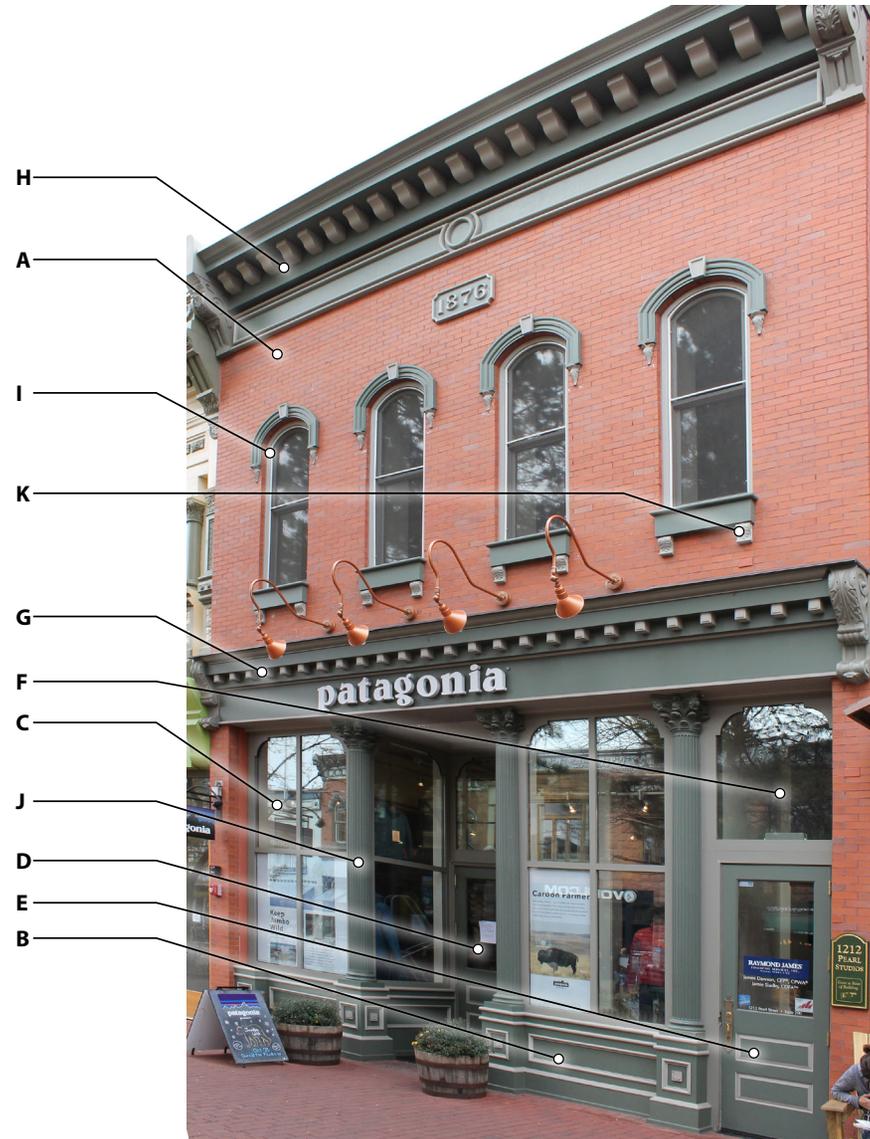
Historic Building Facade Elements (Source: City of Boulder)
